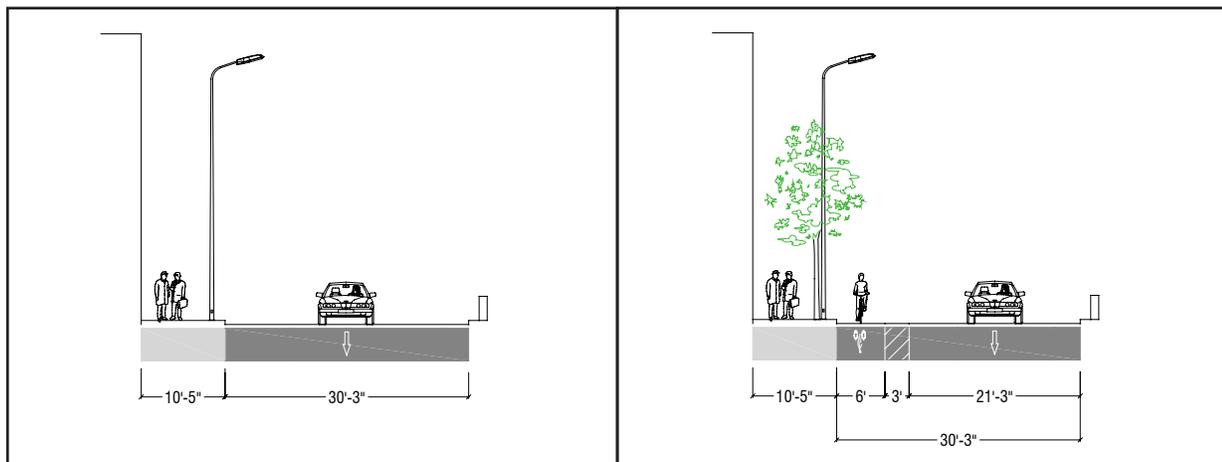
Gerard Avenue between East 140th and East 138th streets, existing and recommended cross section (facing south)
